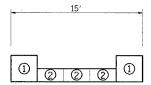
DETAIL: SCOUR REPAIR LT. STA. 684+50 CULVERT OUTLET (W.B.L.) MP 21.4
